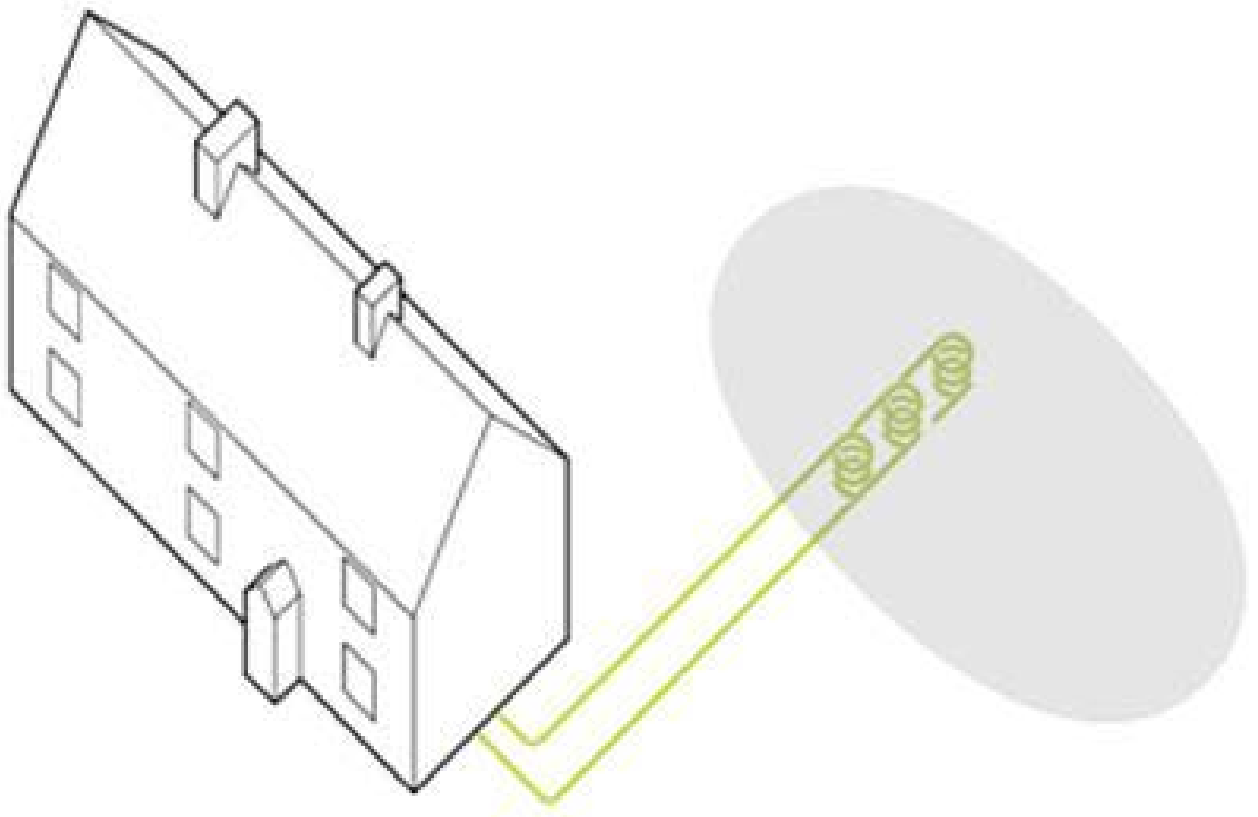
| Schematic of a pond pump system (Source: www.giesp.es).
